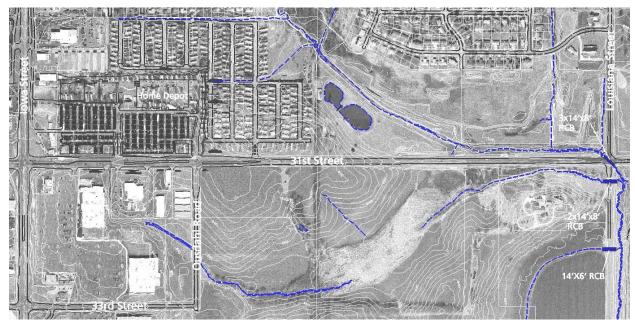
Existing Conditions, Iowa Street to Louisiana Street
